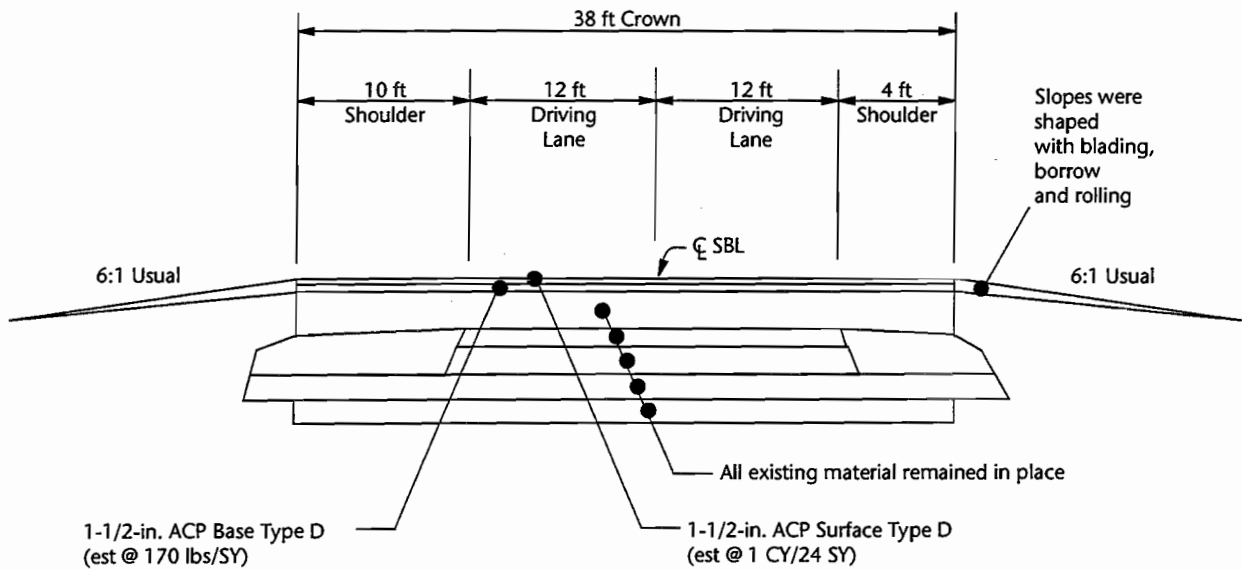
Post-construction cross section of FOB (1 ft=0.304 m, 1 in.=2.54 cm)
